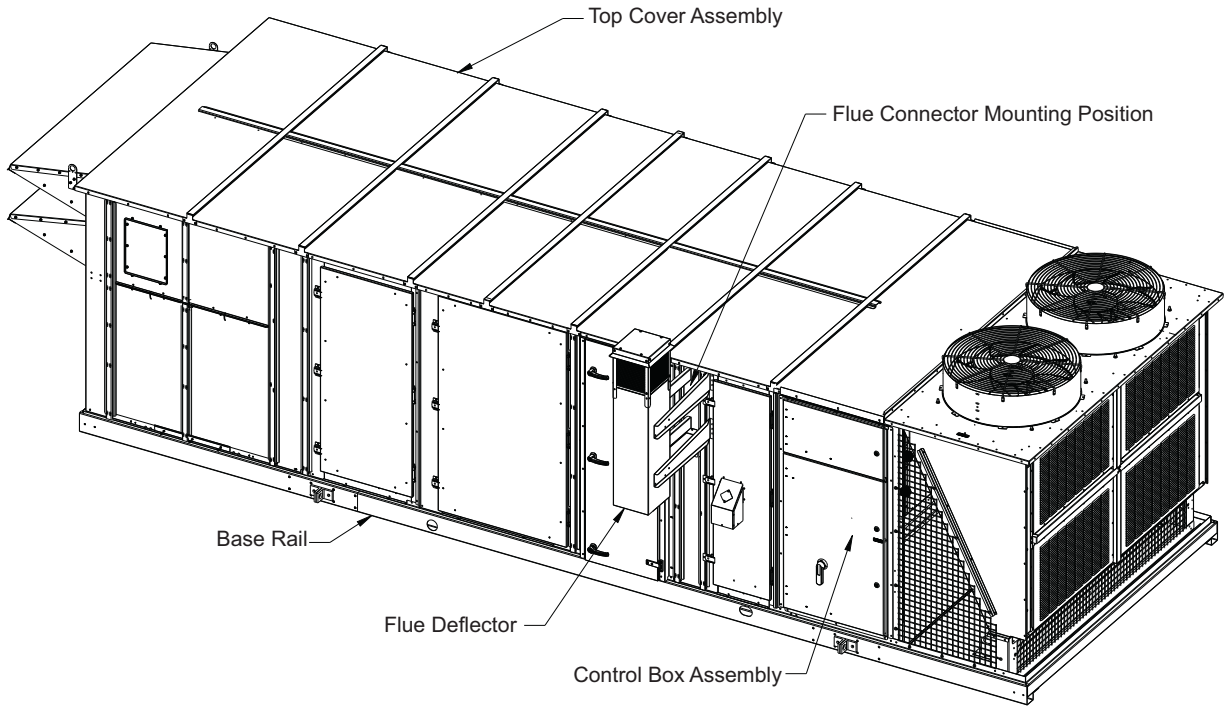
Flue Discharge Deflector Mounting Position – 27.5-50 Ton (Low Heat)
